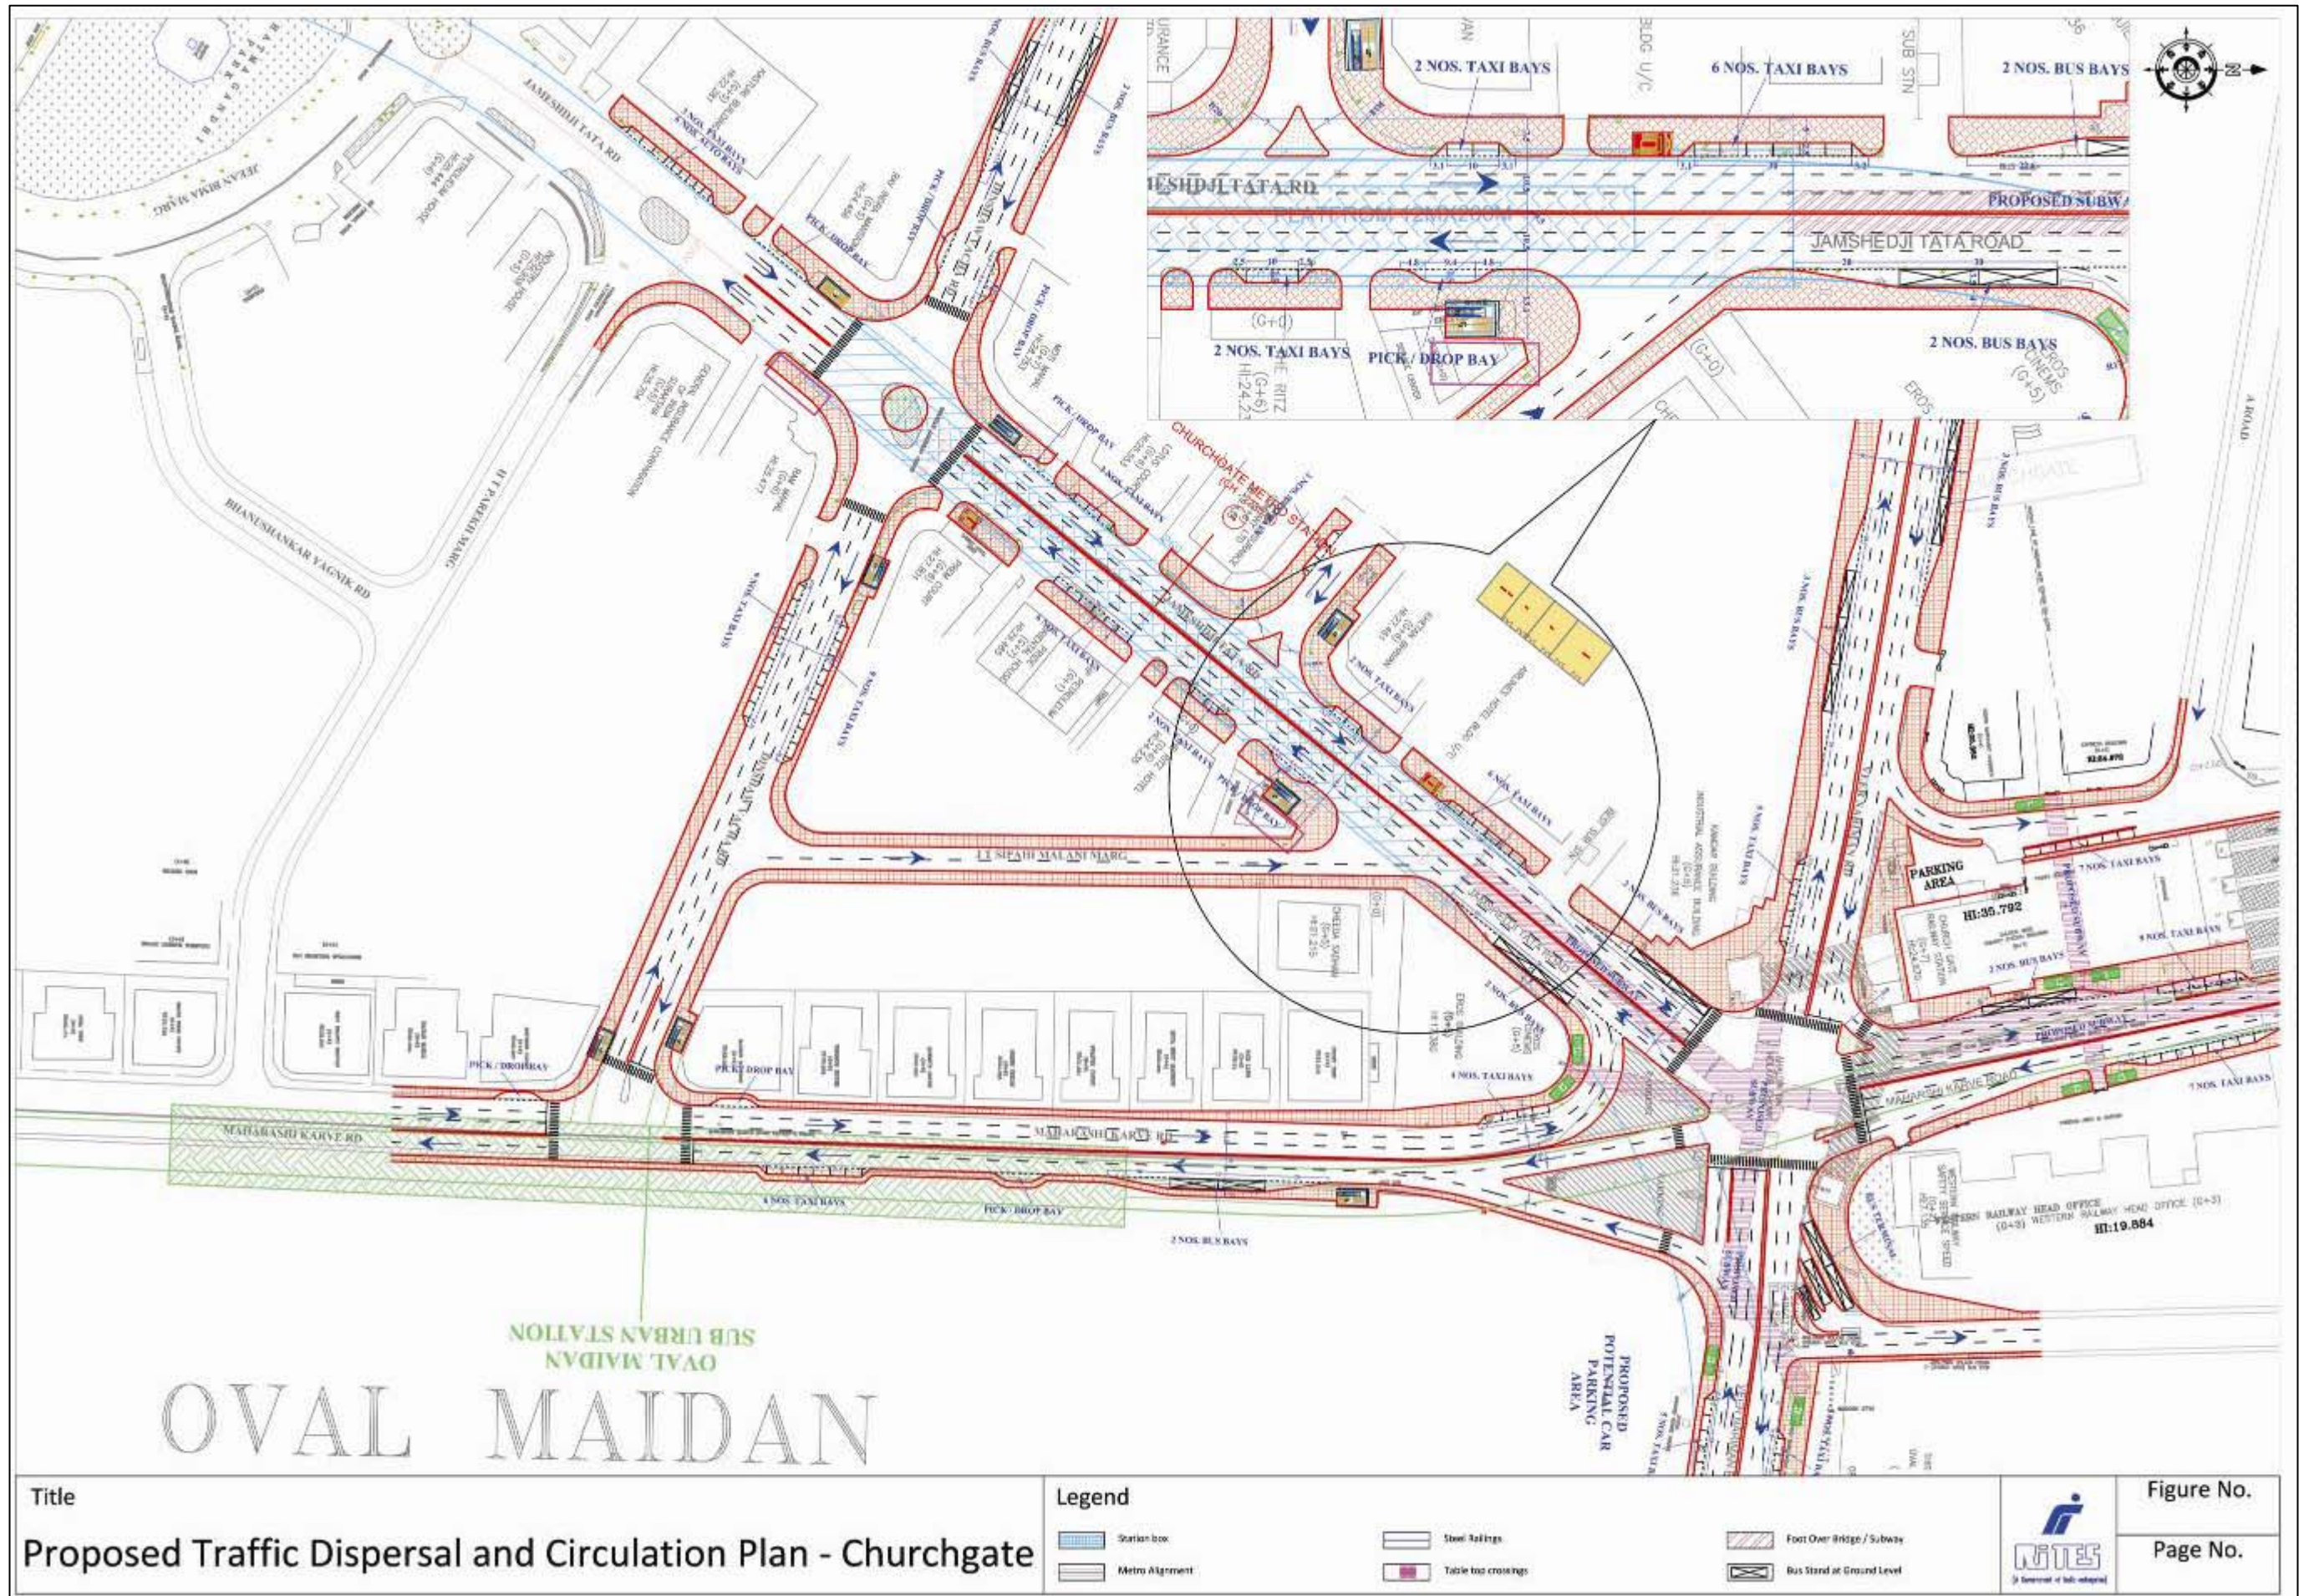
Proposed Traffic Dispersal and Circulation Plan – Churchgate Metro
